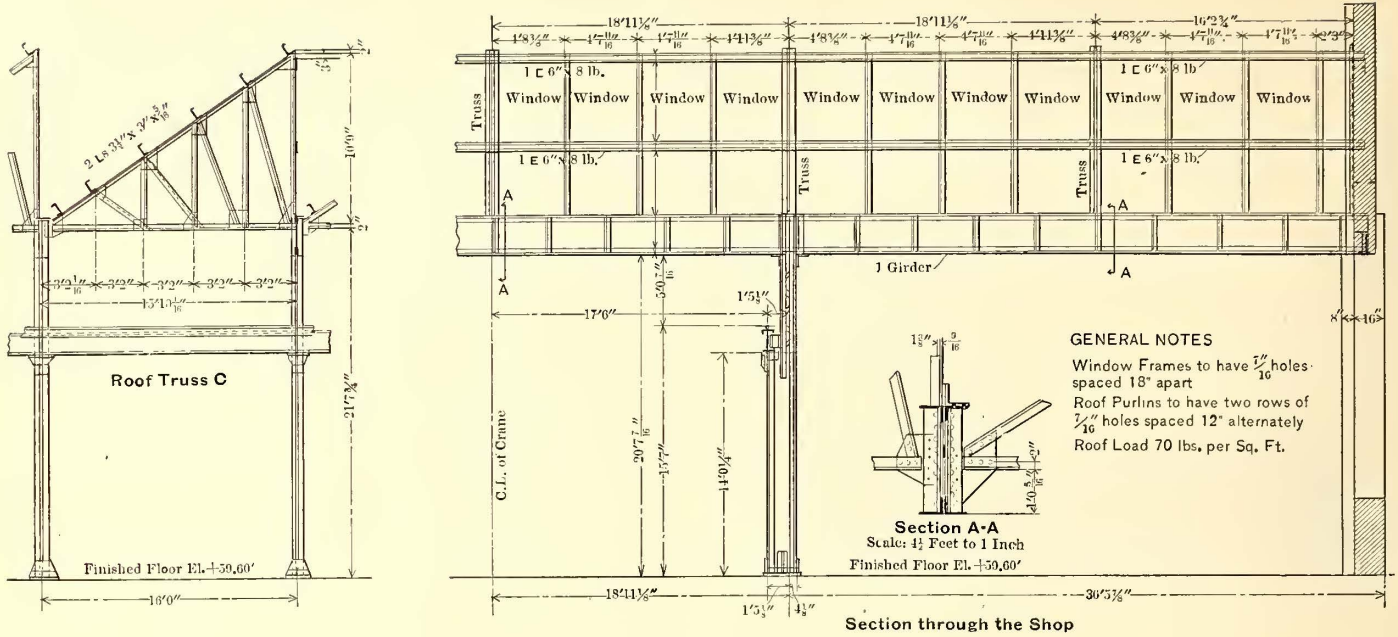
TYPICAL SECTIONS OF THE STEEL SAW-TOOTH CONSTRUCTION AT THE THIRTY-SIXTH STREET PLANT OF THE BROOKLYN RAPID TRANSIT COMPANY
